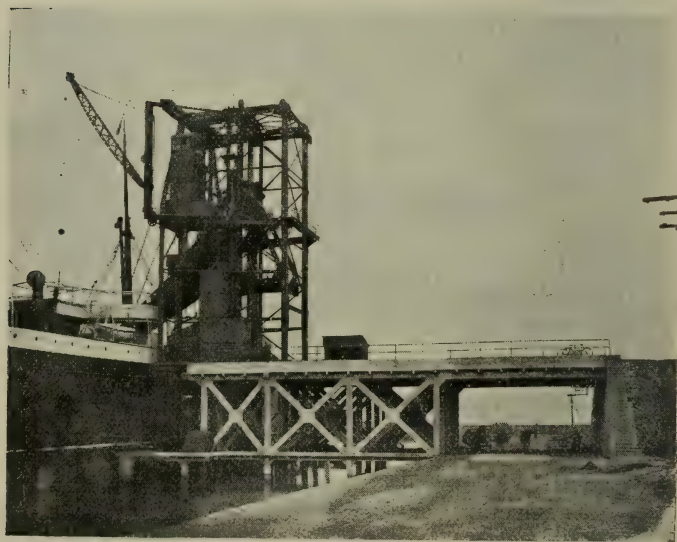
REINFORCED CONCRETE WHARF AT PORT TALBOT.
